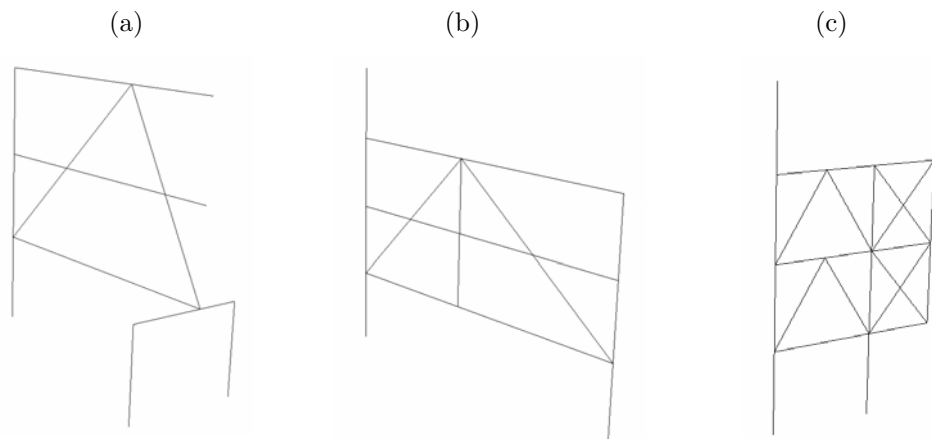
Internal truss systems of (a) Truss 1, (b) Truss 2 and (c) Truss 3. Their locations are shown in Figure 9.4.
